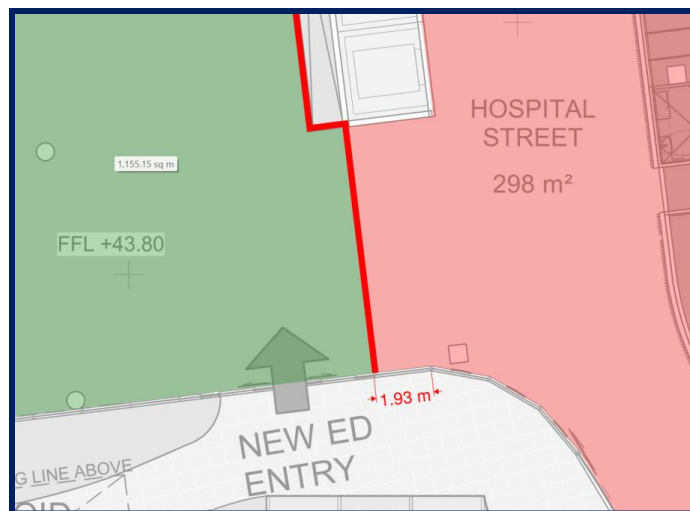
External Separation Between Fire Compartments (Ground Floor)
